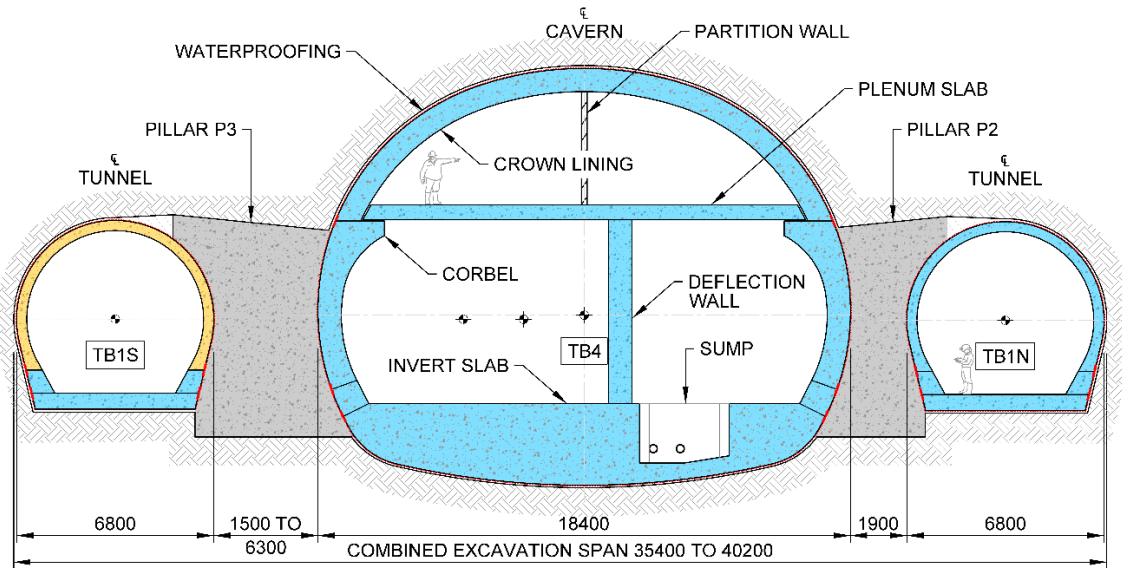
Section through permanent tunnel lining of TB1N running tunnel, TB4 cavern, TB1S running tunnel, and P3 and P2 pillars.
